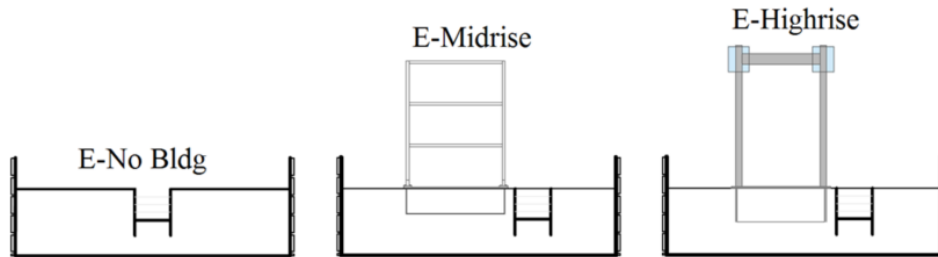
Centrifuge testing plan to study the seismic response of a braced excavation in isolation and near a midrise and highrise building.
